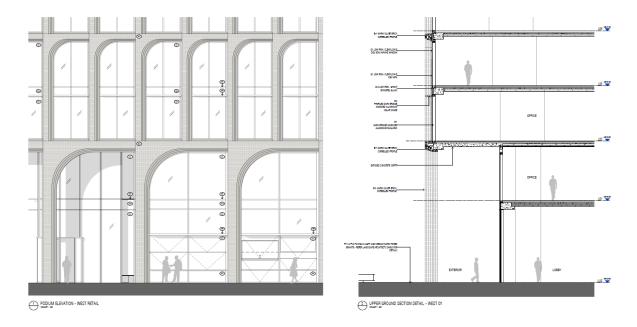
Podium Elevation (left) and Podium Upper Ground Section Detail
